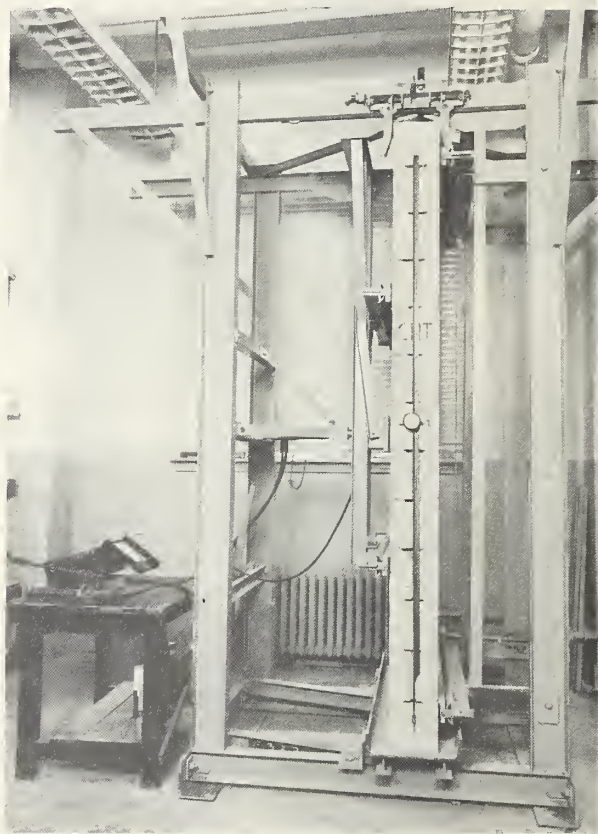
Concrete masonry wall in flexural load test frame.
